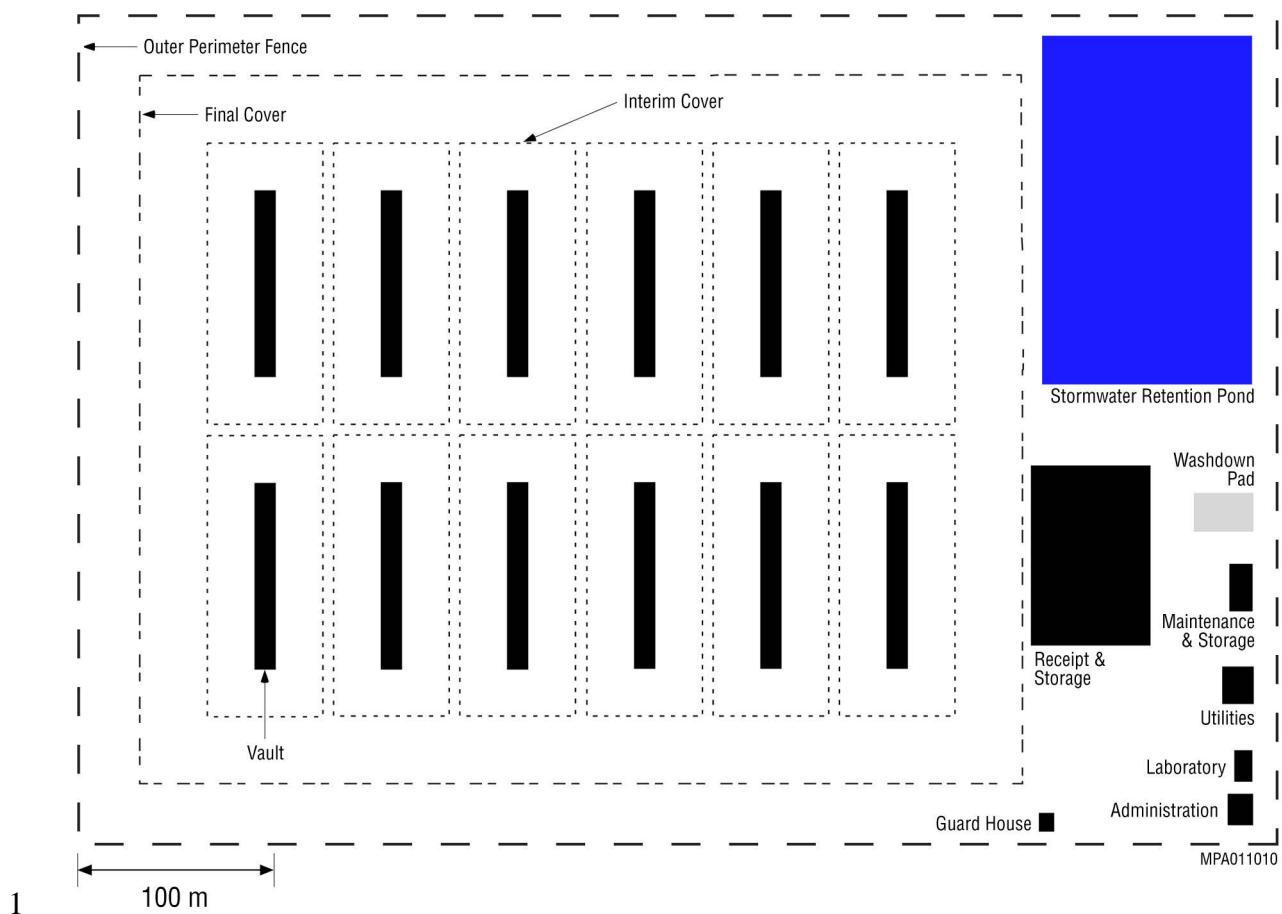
Layout of a Conceptual Trench Disposal Facility
